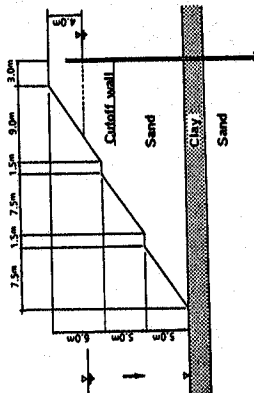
Section of Graving Dry Dock for Optimum Design of Drainage Pipes
